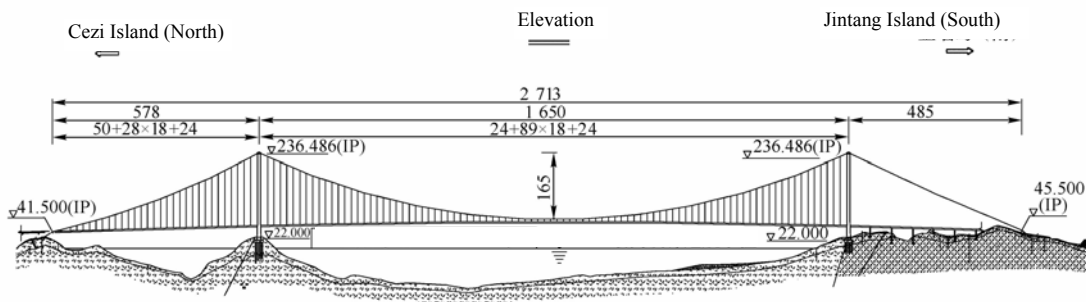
Arrangement of Xihoumen Bridge (Unit: m)
